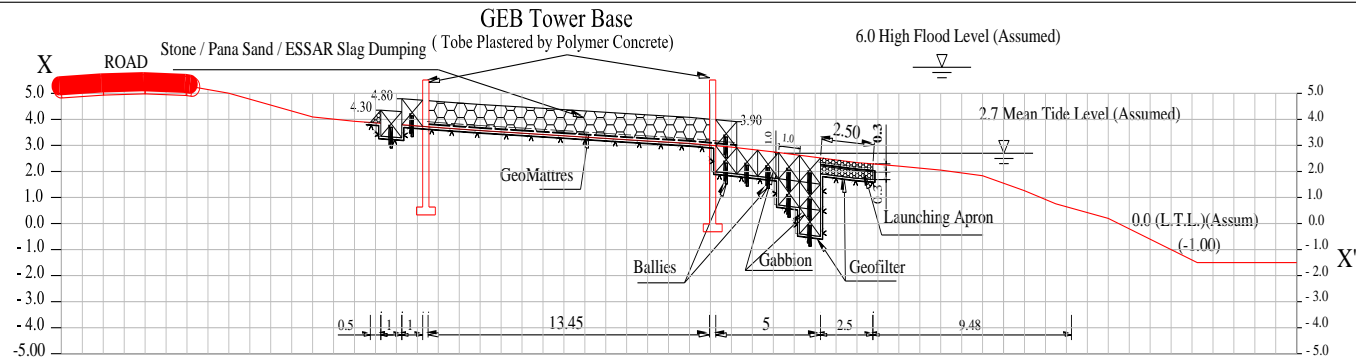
(a): Plan for Foundation Protection along Tower No: 48
